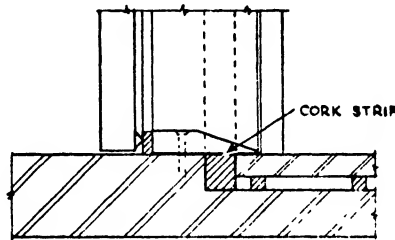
SEAL TO SILL ON FLOATING FLOOR
